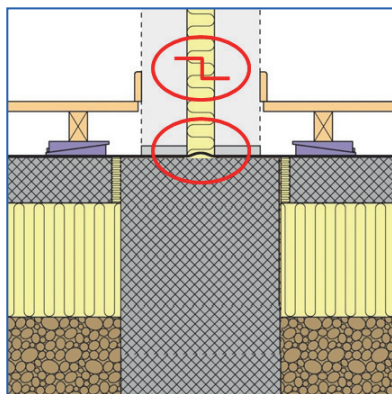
Typical errors such as insufficiently separated double walls with wall ties bridging the cavity wall or both leaves of the cavity wall located on the same foundation, compare with Figure 5.7.
